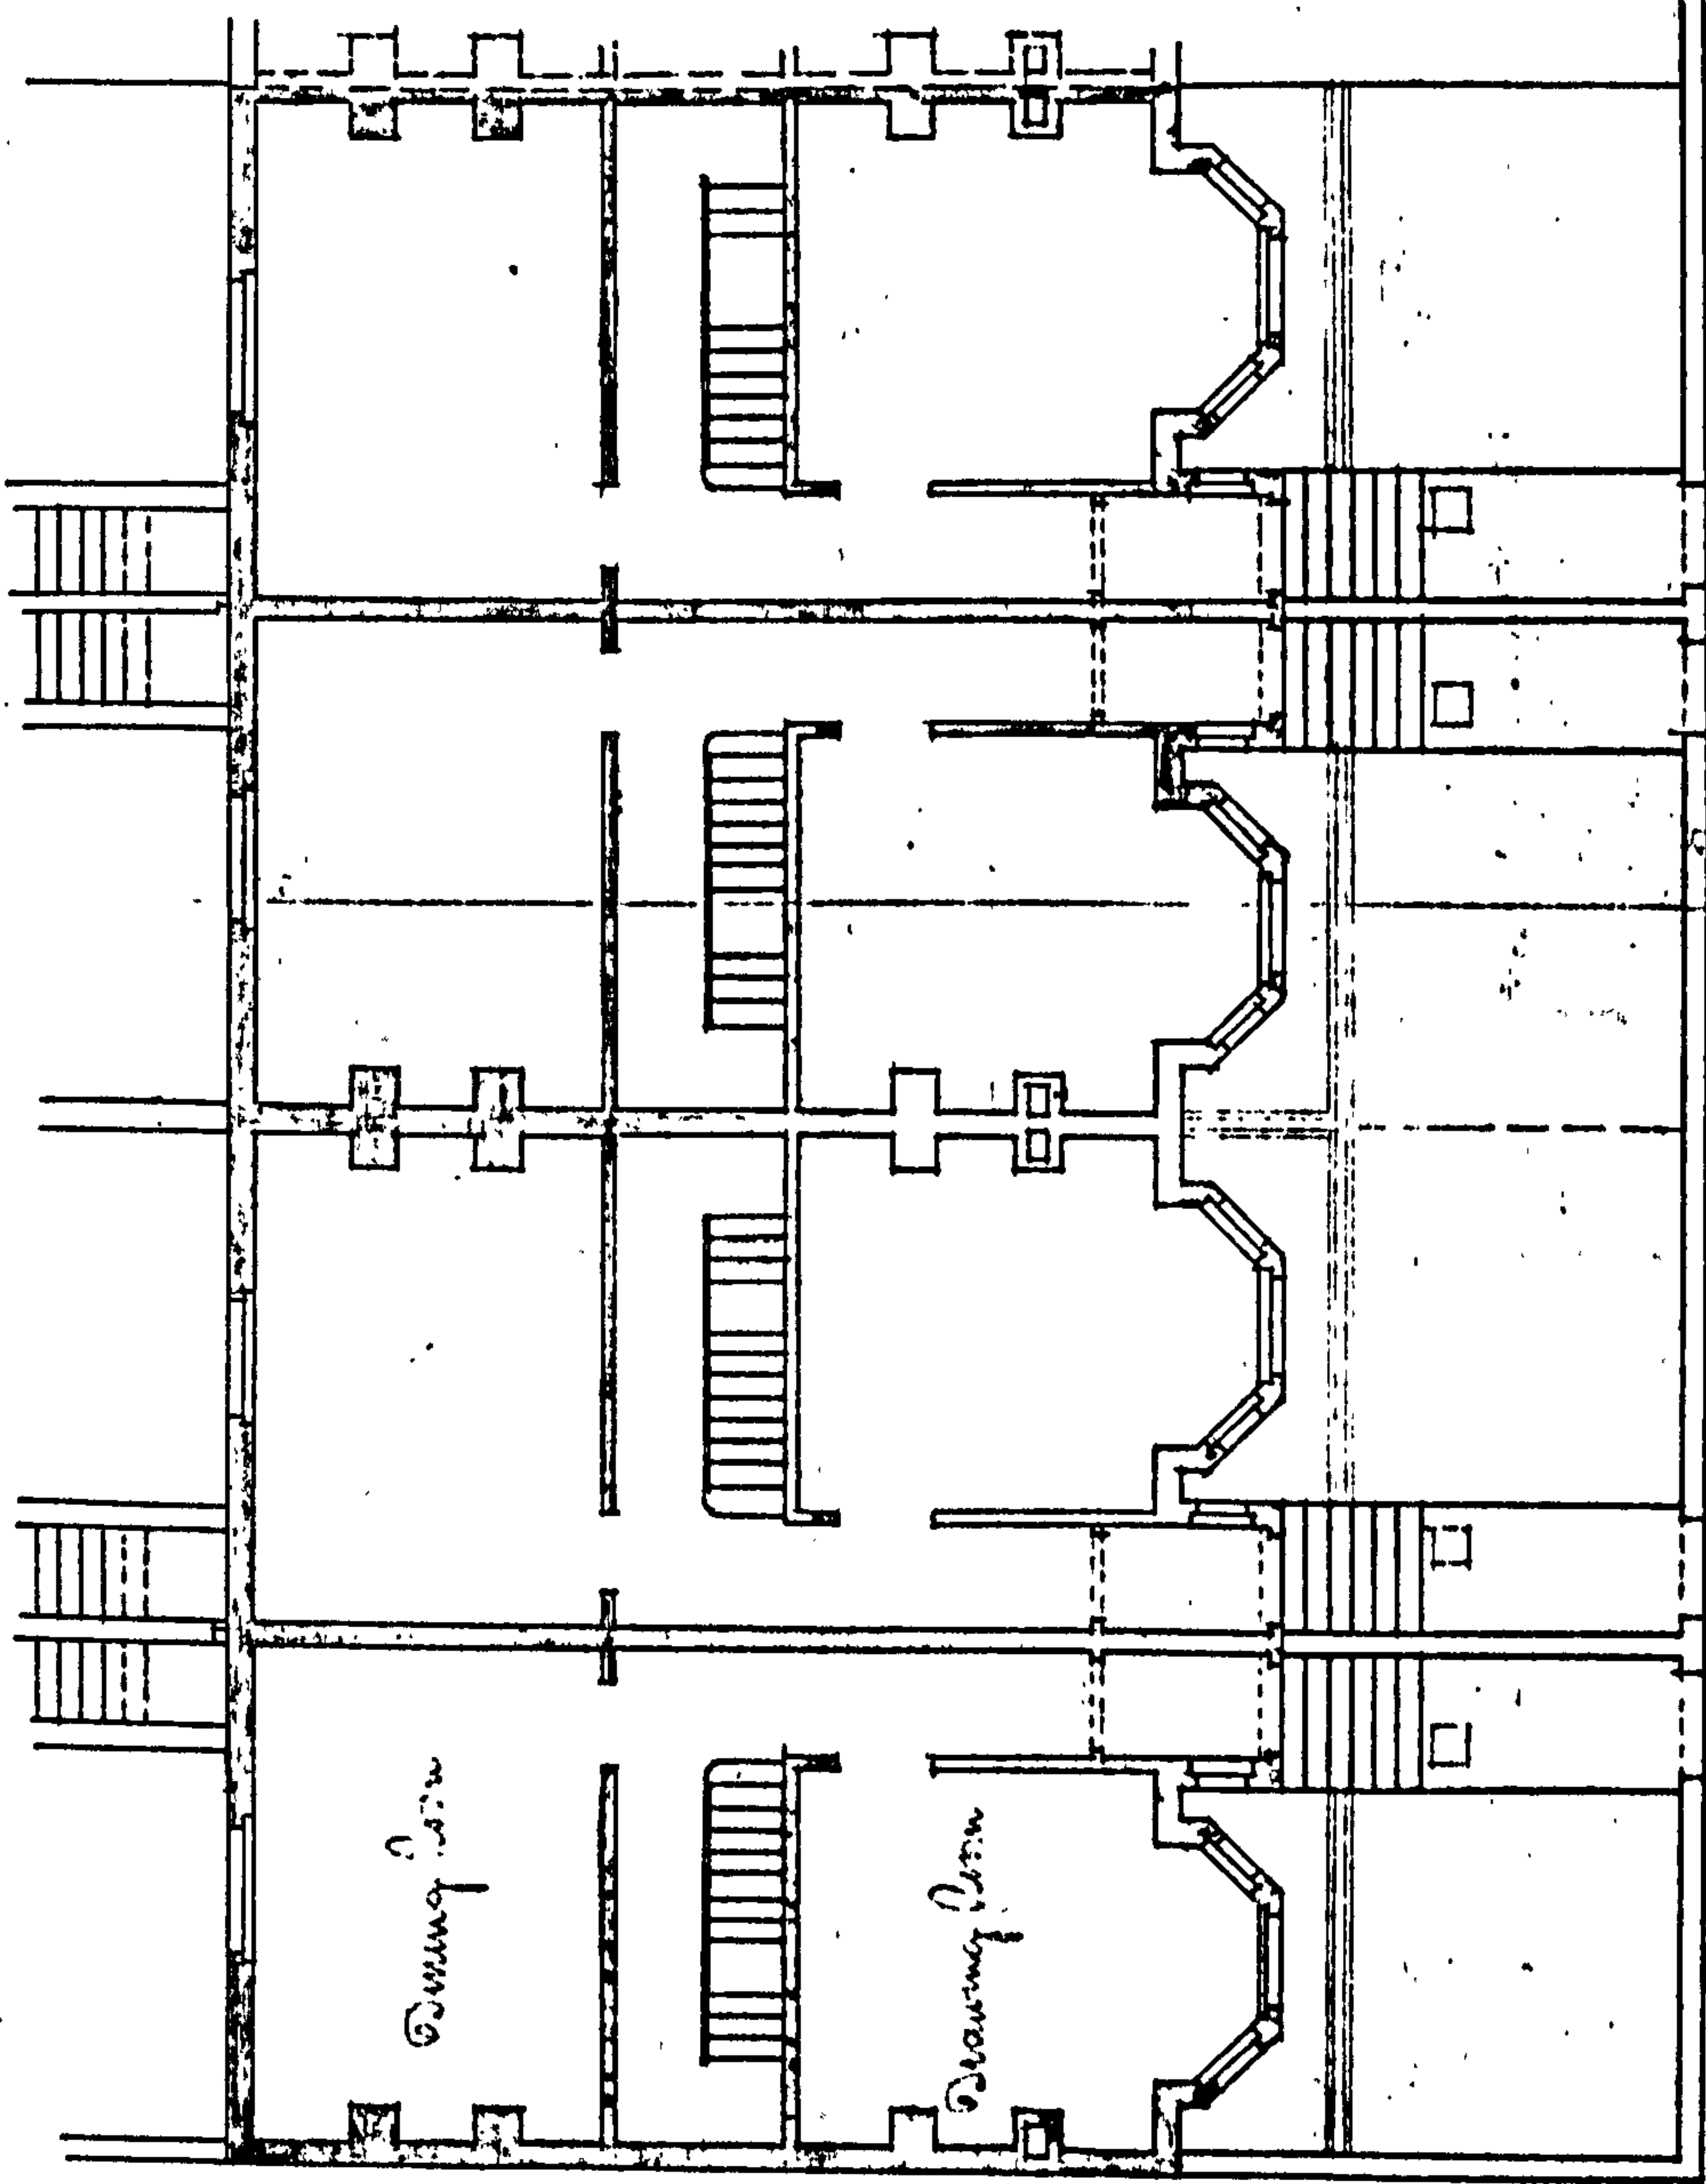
Deposited basement and ground floor plan of two through houses, Chestnut Avenue (P. Robinson 1896).
